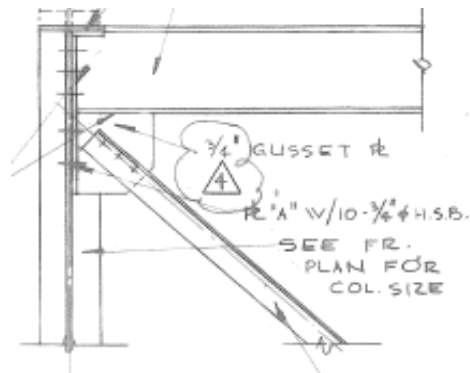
Top Connection Detail (88UT1A--A-1516-1)
